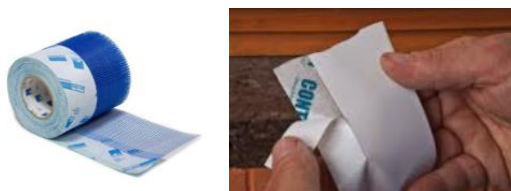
2 part tape used to seal between a wall/ window/ membrane and a plaster air barrier
